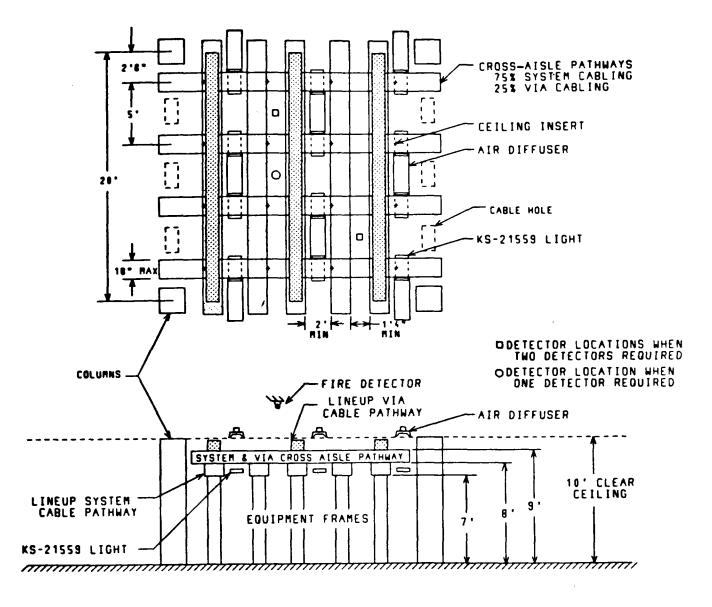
Cable Pathways Plan for 7- to 10-Foot Space
